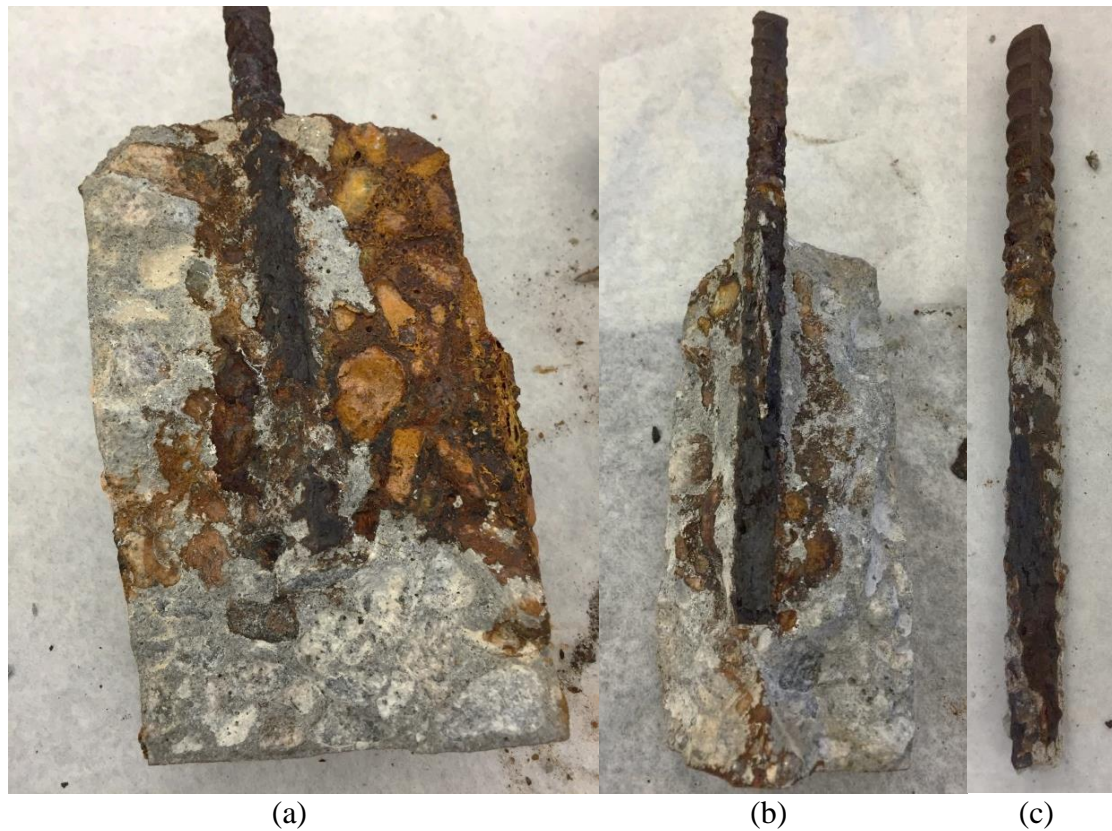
Final condition of steel reinforcement and concrete in corrosion test specimens using (a) Control sand and (b) Site H sand. (c) Typical condition of steel rebar at the end of the test.
